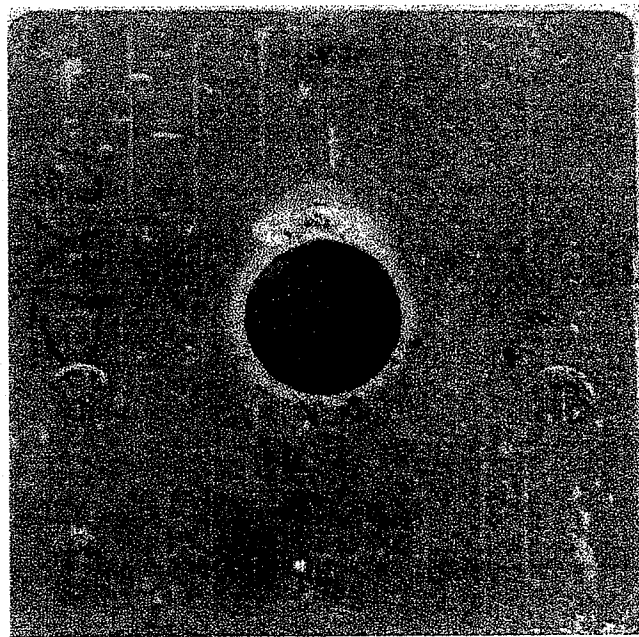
Typical Damage to Bottom Face Sheet in Specimens Using Type 3 Connection
